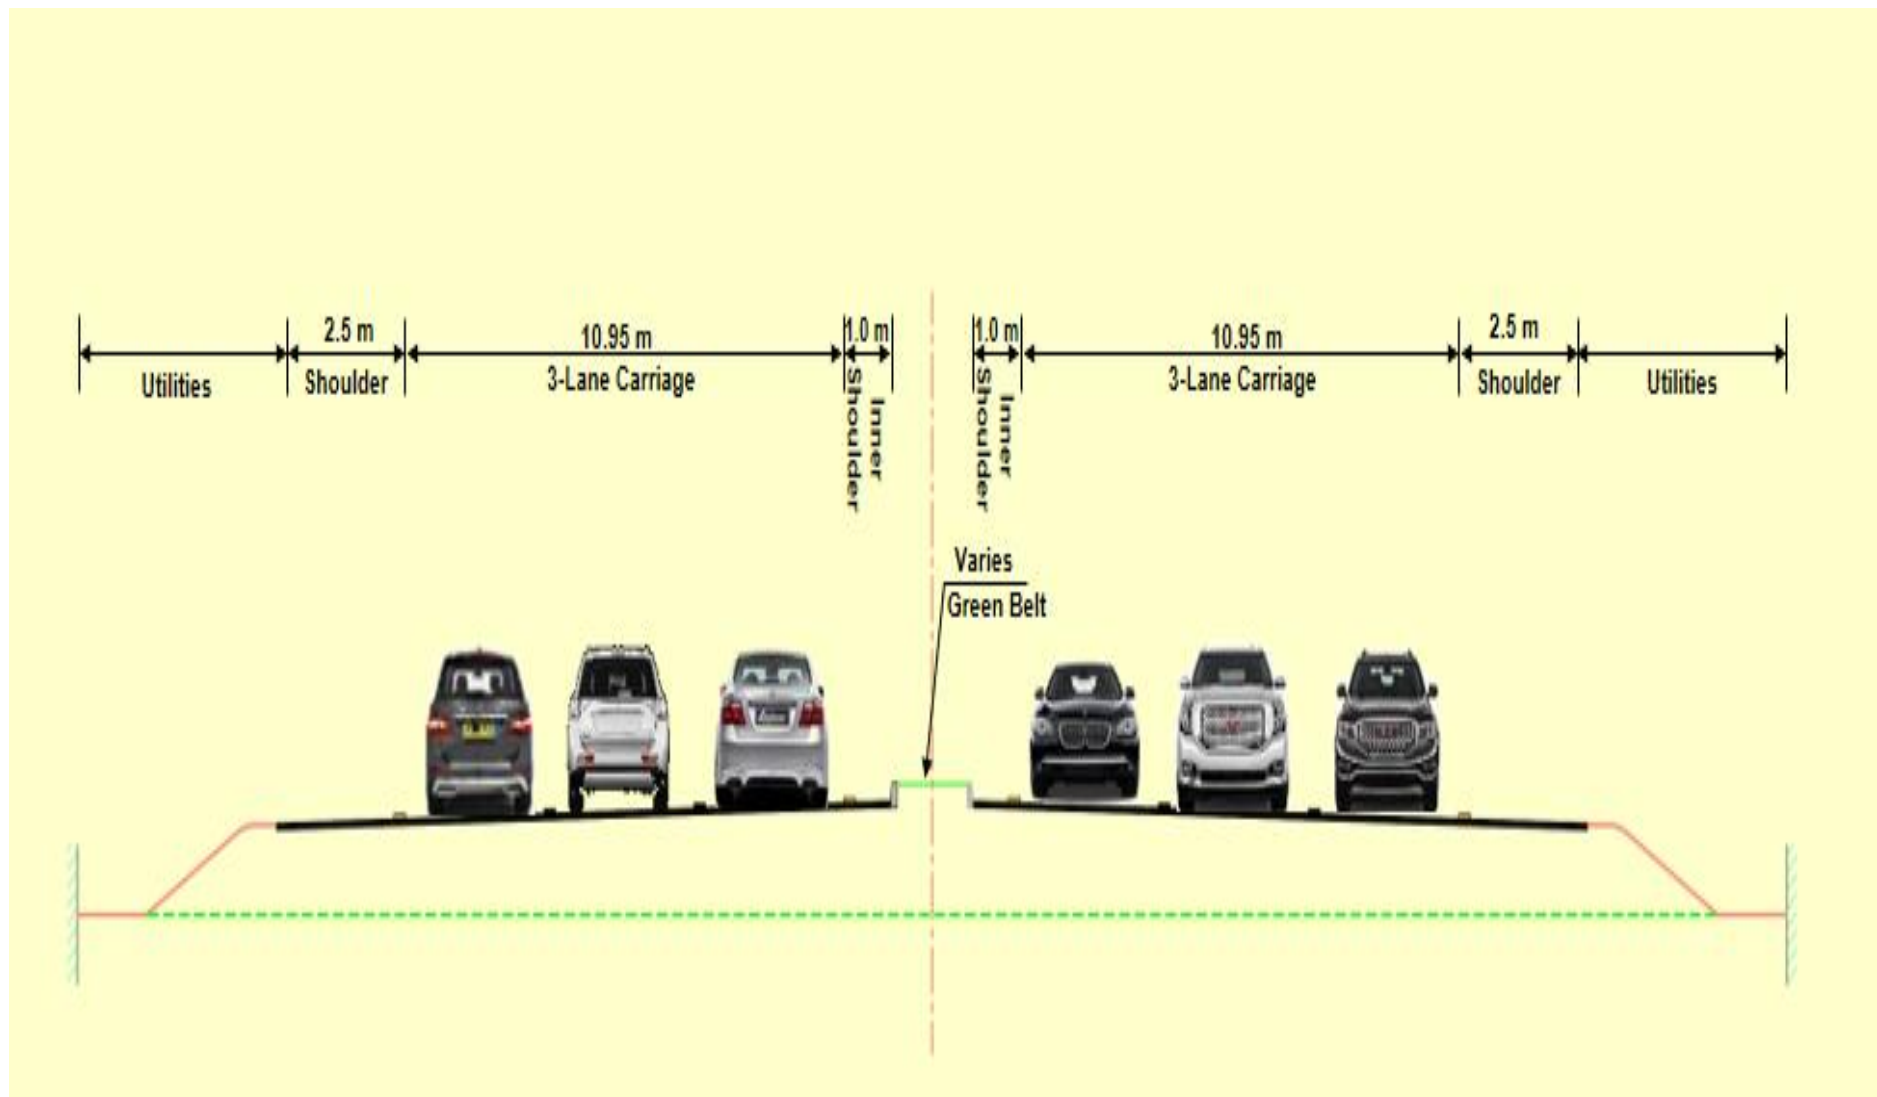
Typical Cross Section of the 3 Lane Road Without Service Road
